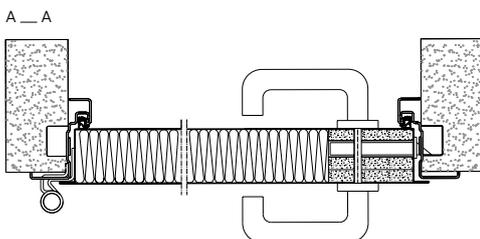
Horizontal cross-section of the fire-rated large-size steel seamless door with a corner frame
